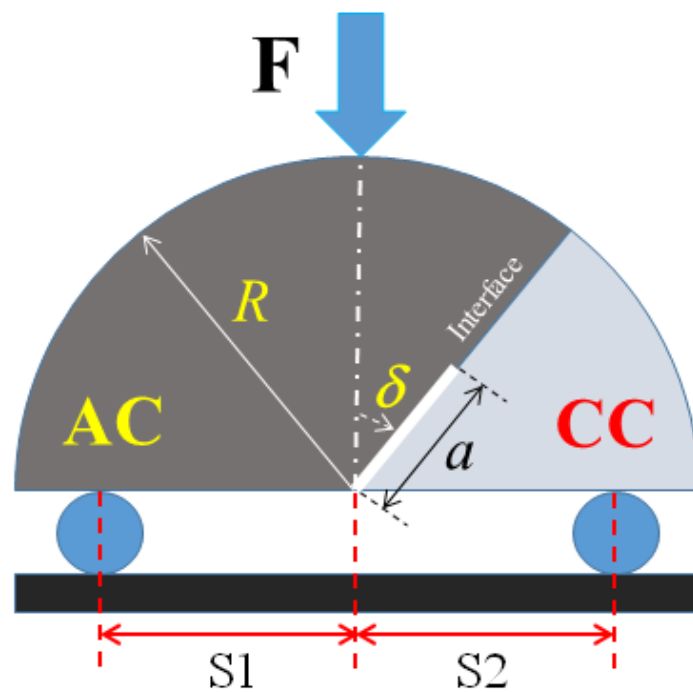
Scheme of the CSCB specimen made of asphalt concrete and Portland cement concrete.
